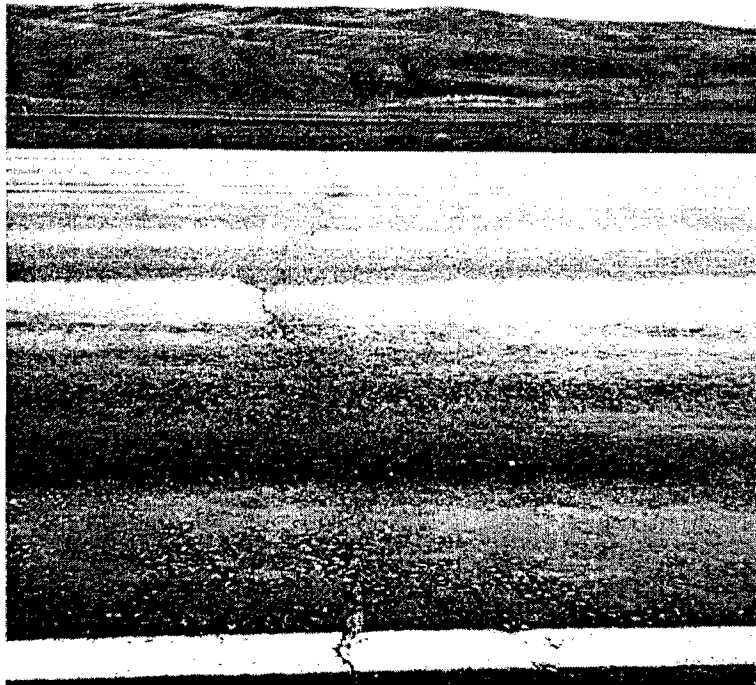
Low Temperature Cracking at Kingsbury Road Test Section
